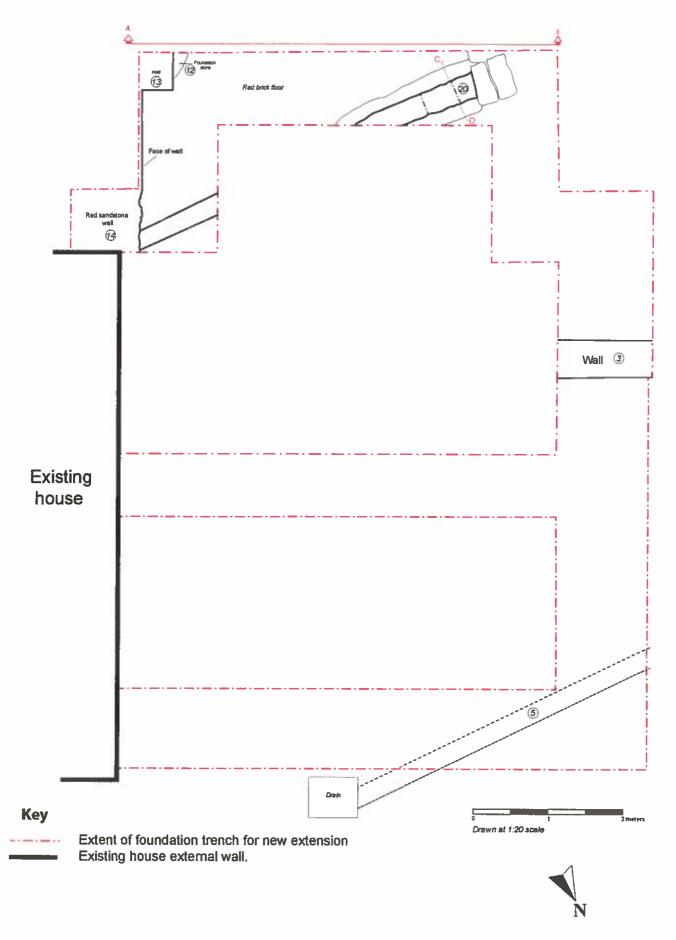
Ground Plan of foundation trench outlined in red. Undertaken following recording of early floor surface.
